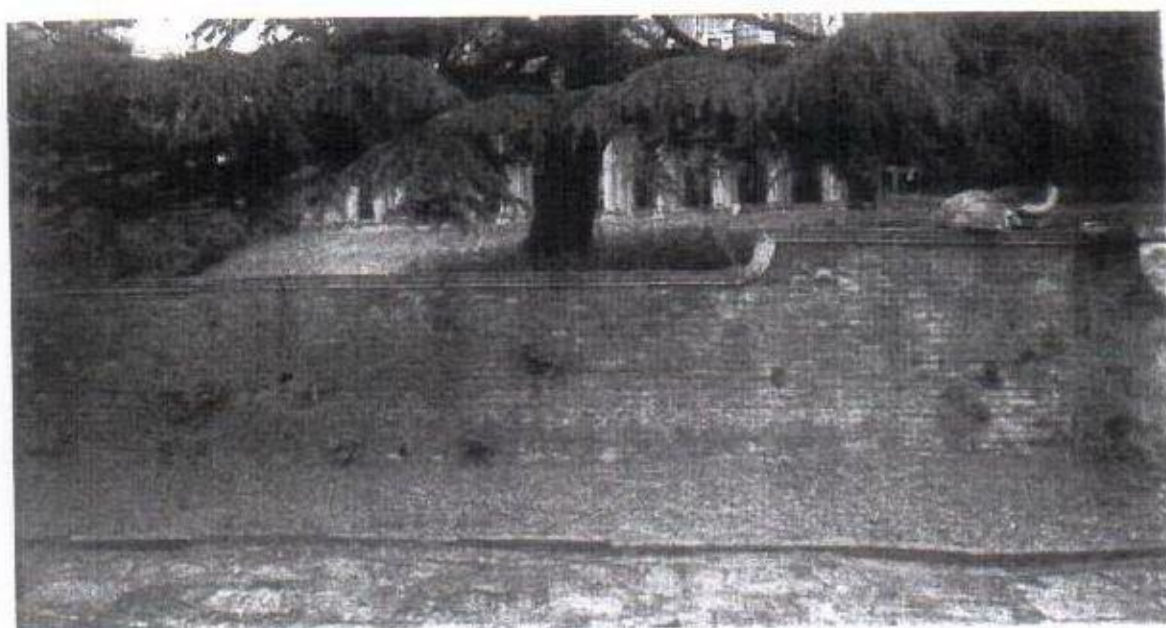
ITALIAN TERRACED GARDENS TOP HEAD WALL 18
